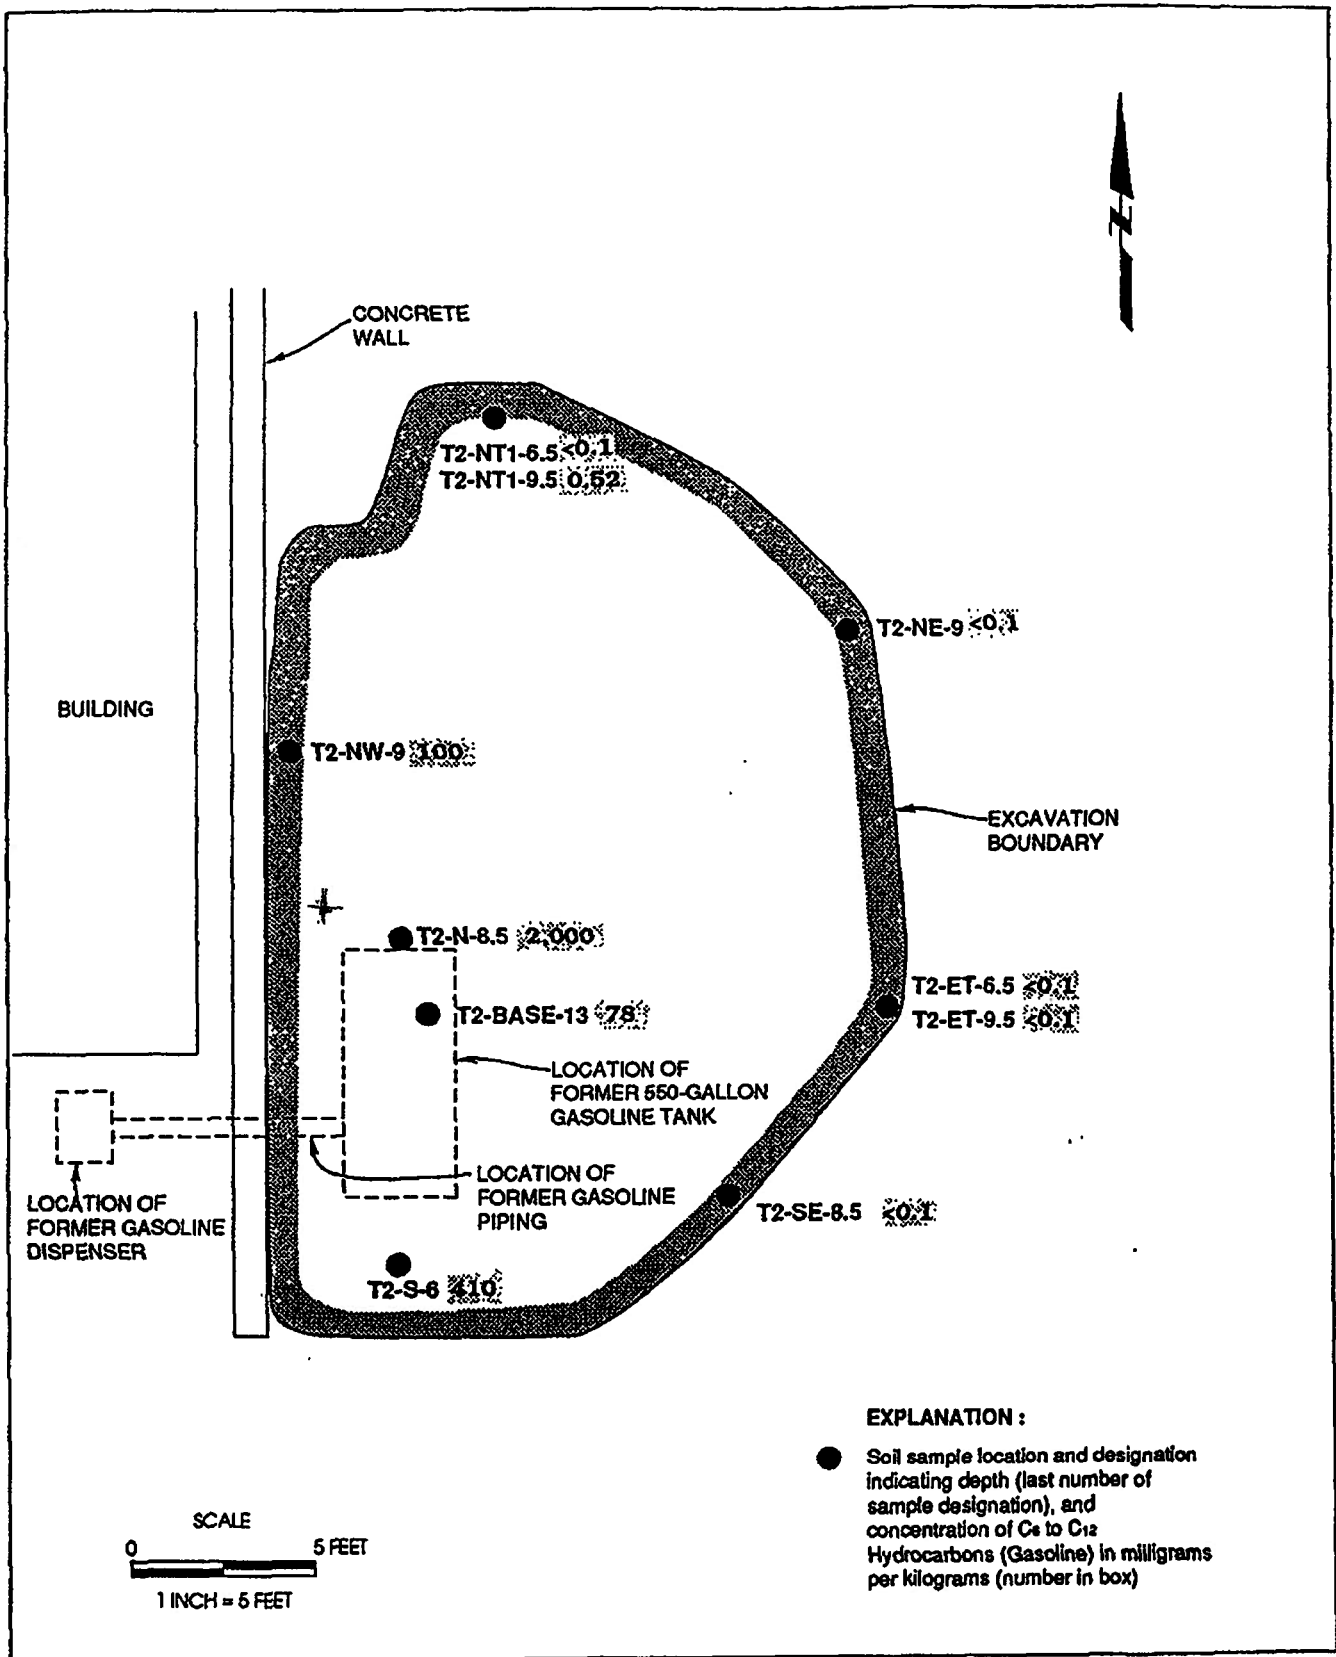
SITE PLAN SHOWING FORMER TANK LOCATION, EXCAVATION AND SOIL SAMPLE LOCATIONS
